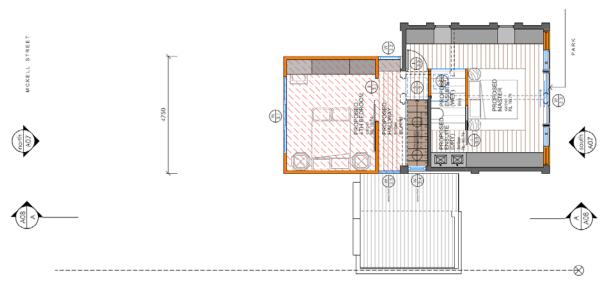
Proposed second floor with additional bedroom and new ensuite at 2 McKell Street.
